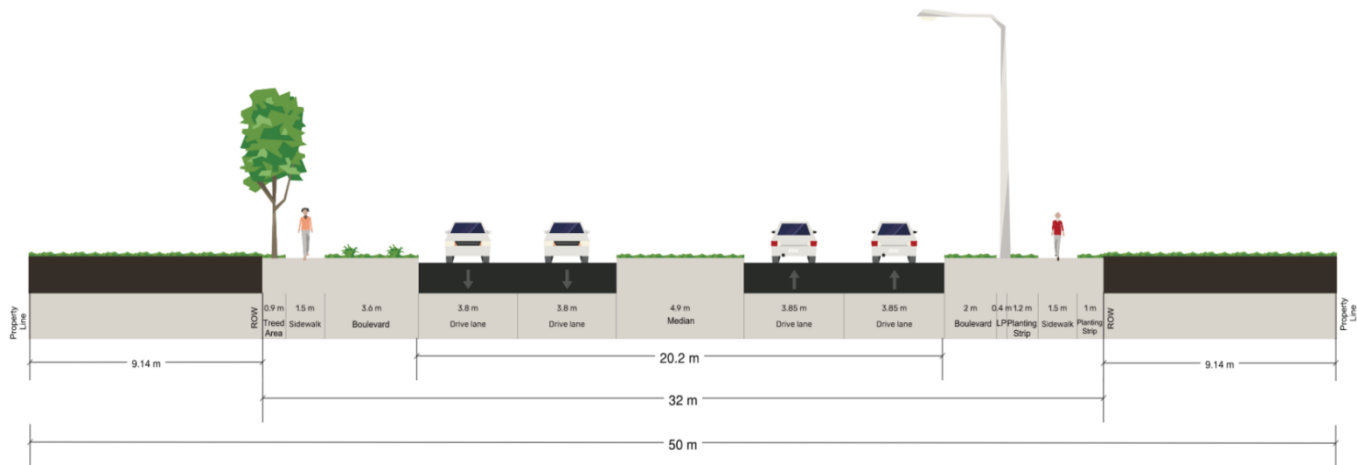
EXISTING CROSS-SECTION, WEST OF BRAMALEA RD
